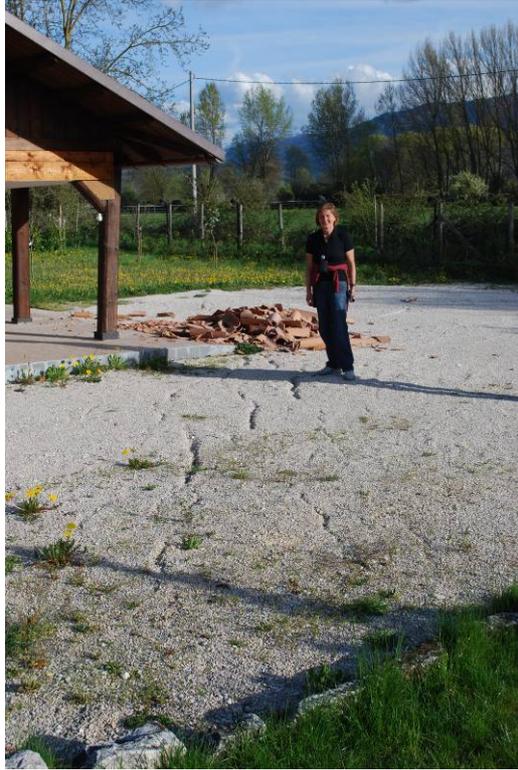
Failure of side-hill fill embankment (42.420N 13.376E).
